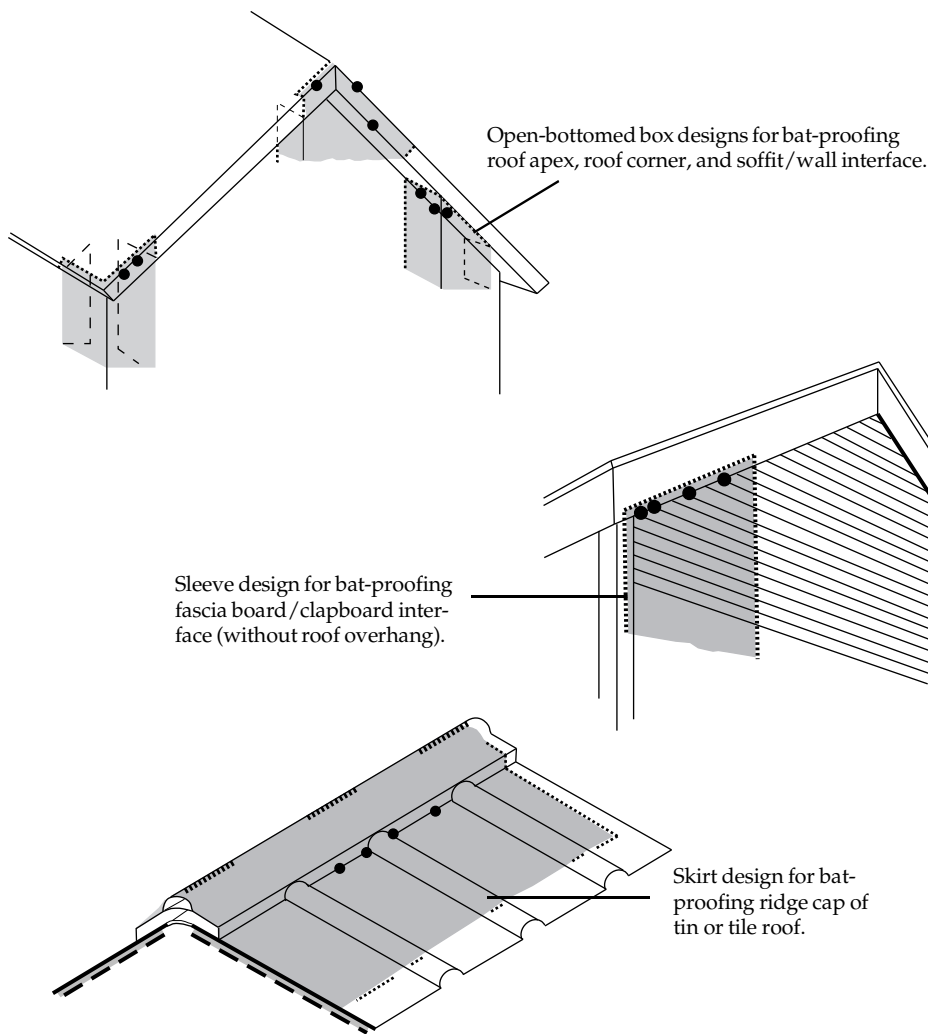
Sample configurations for Frantz' checkvalve (Key:  = birdnetting; = attaching to structure; • = exit/entry holes of bats).
